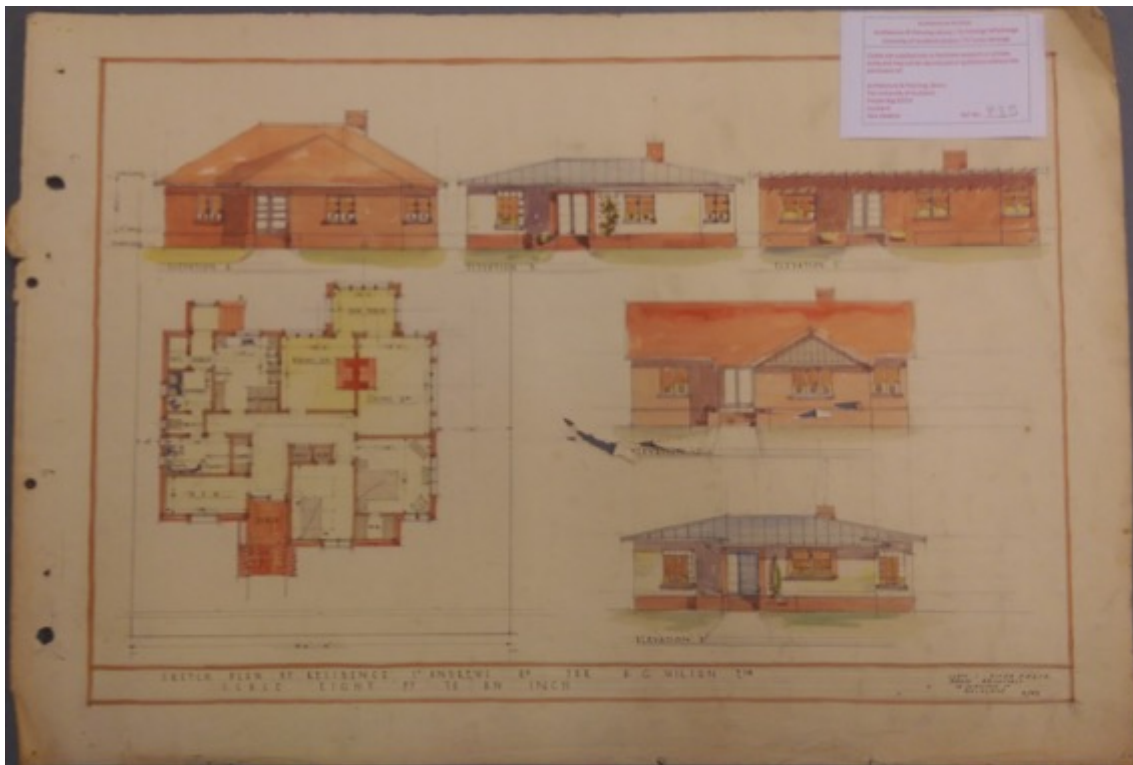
Sketch plan of residence on St Andrews Road designed by Llew S. Piper for A. G. Wilson, 1943(?), showing a several renderings of elevations (P15, Auckland University Architecture Archive).
